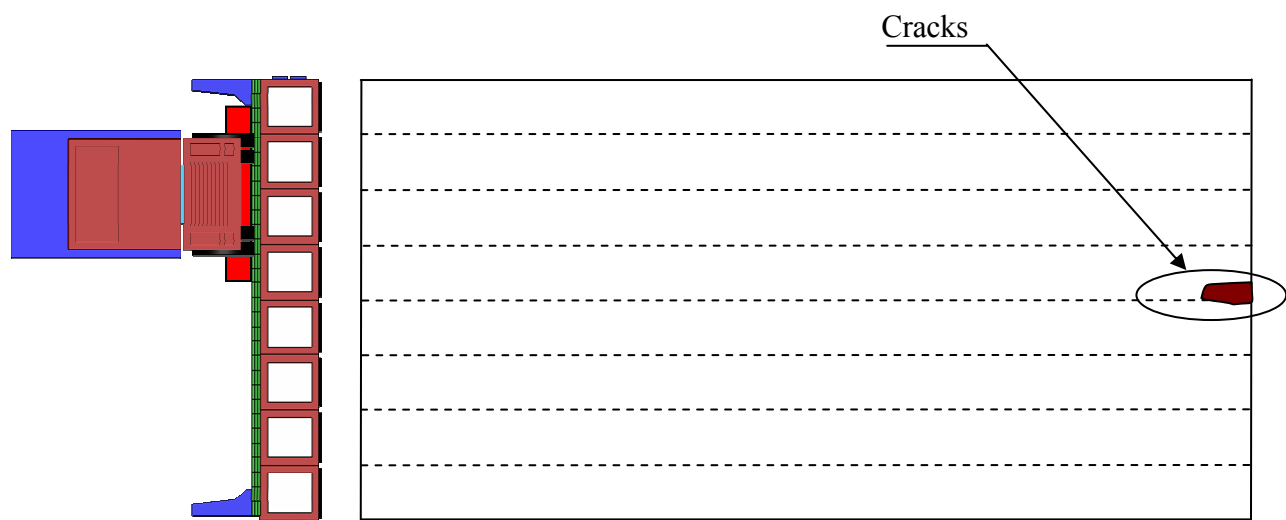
Crack development in the slab bottom surface after applying AASHTO HL-93 load.
